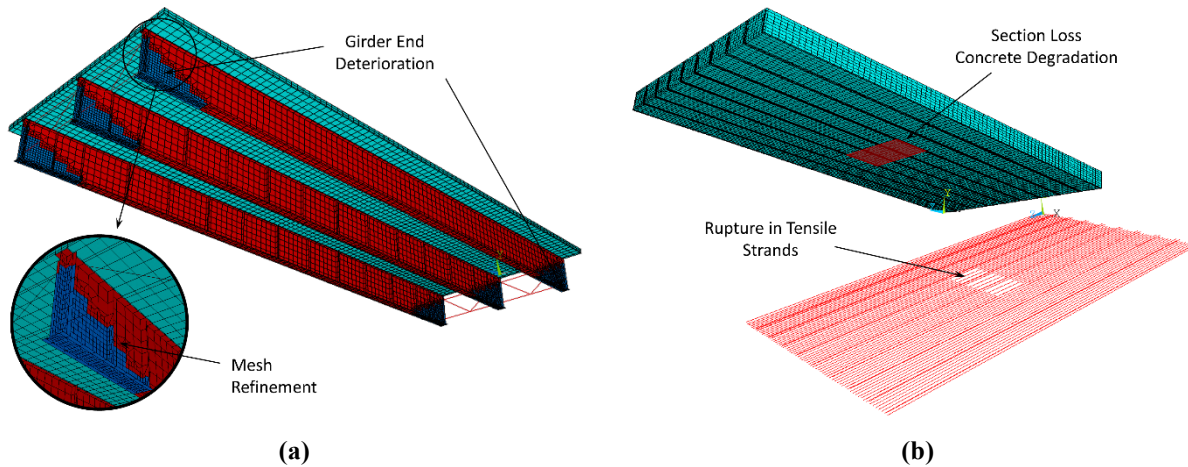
Developed FE model with integrated damage (a) corrosion in steel girders (b) strand rupture in prestressed box girders
